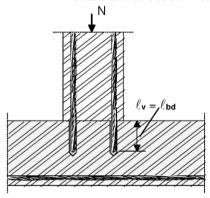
Rebar connection of components stressed primarily in compression. The rebars are stressed in compression.
